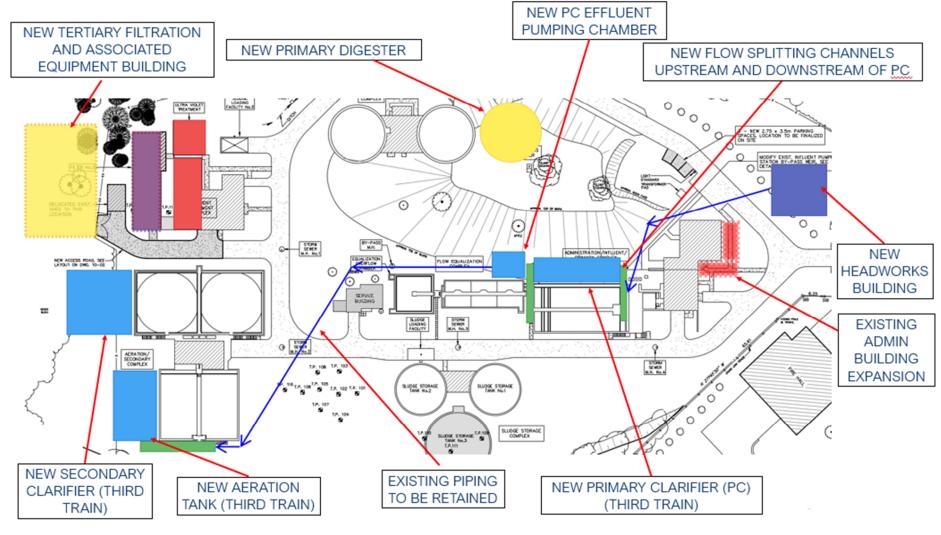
Conventional Activated Sludge (CAS) Facility Expansion Layout
